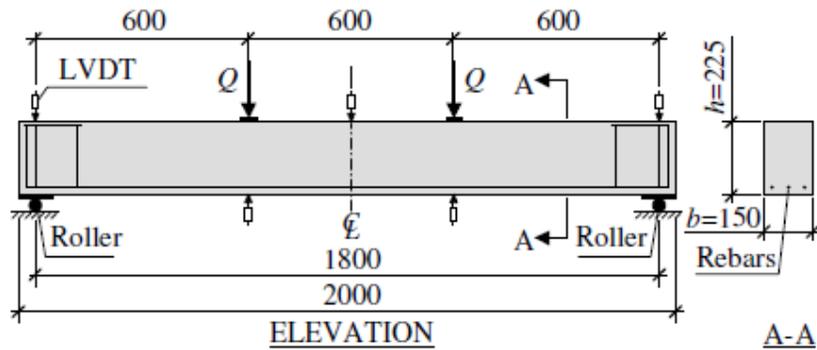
Dimensions and loading conditions for the beam tests, from Jansson (2008)
